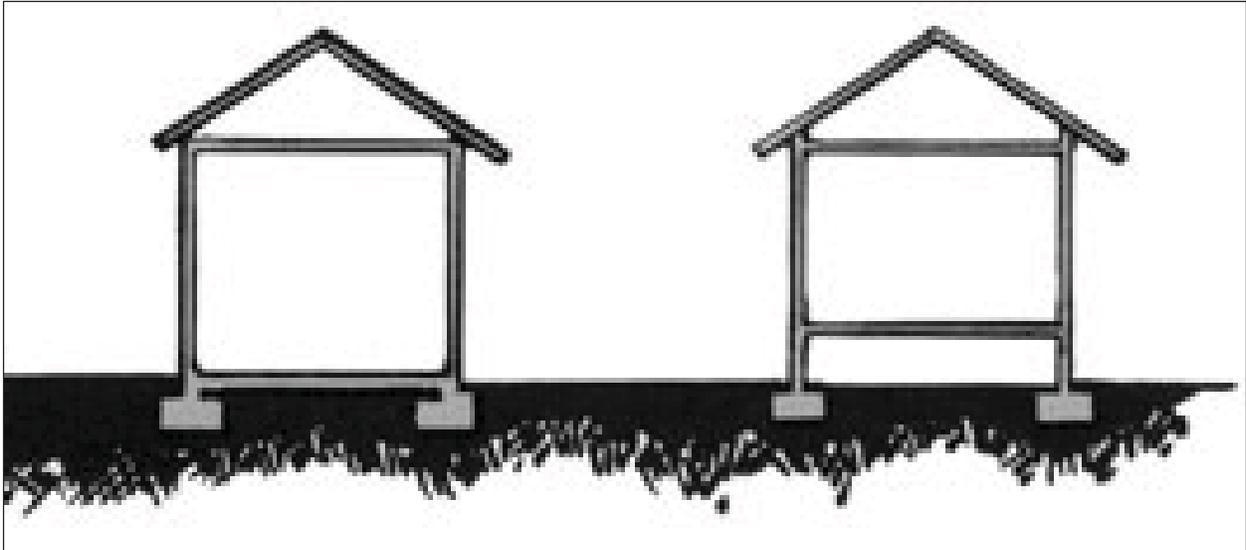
Foundation Types—Slab (left) and Crawlspace (right)
